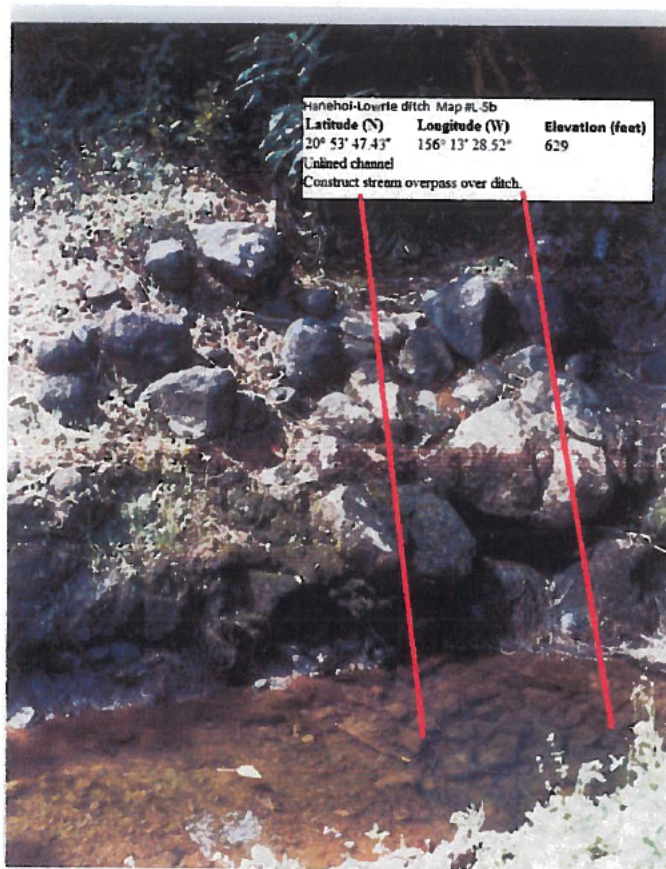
(above): Hanehoi West #1 at Lowrie Ditch (L-5b)
